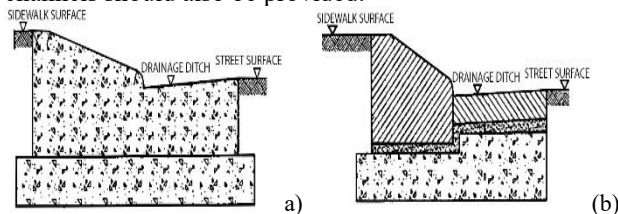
Concrete curb cross-section (a) and natural stone curb cross-section (b)
